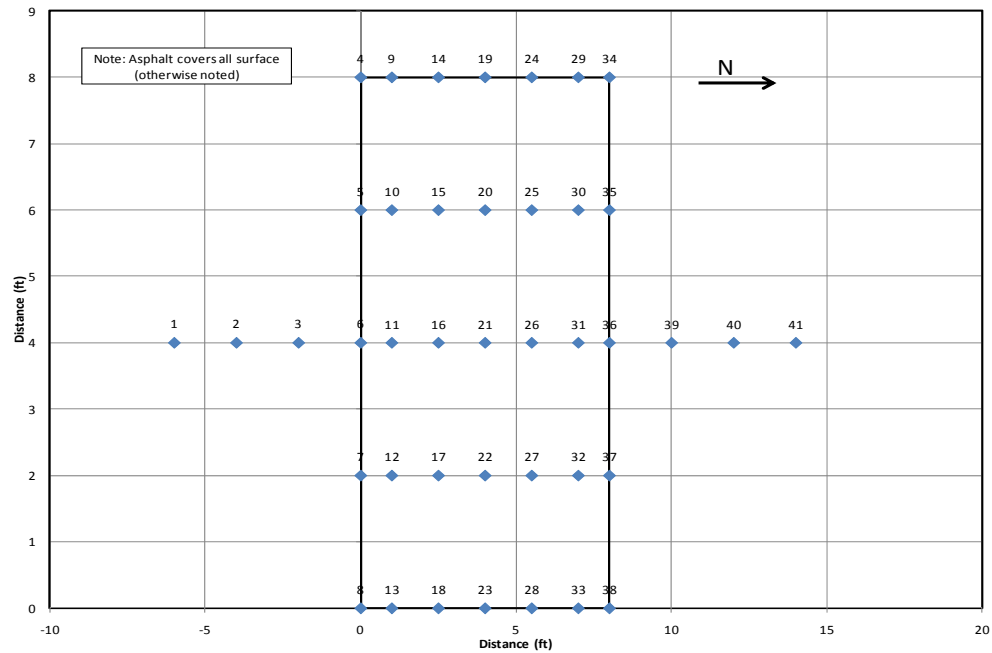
Location of points used to survey the elevation of the surface of the pavement on top of the trench and surrounding area
